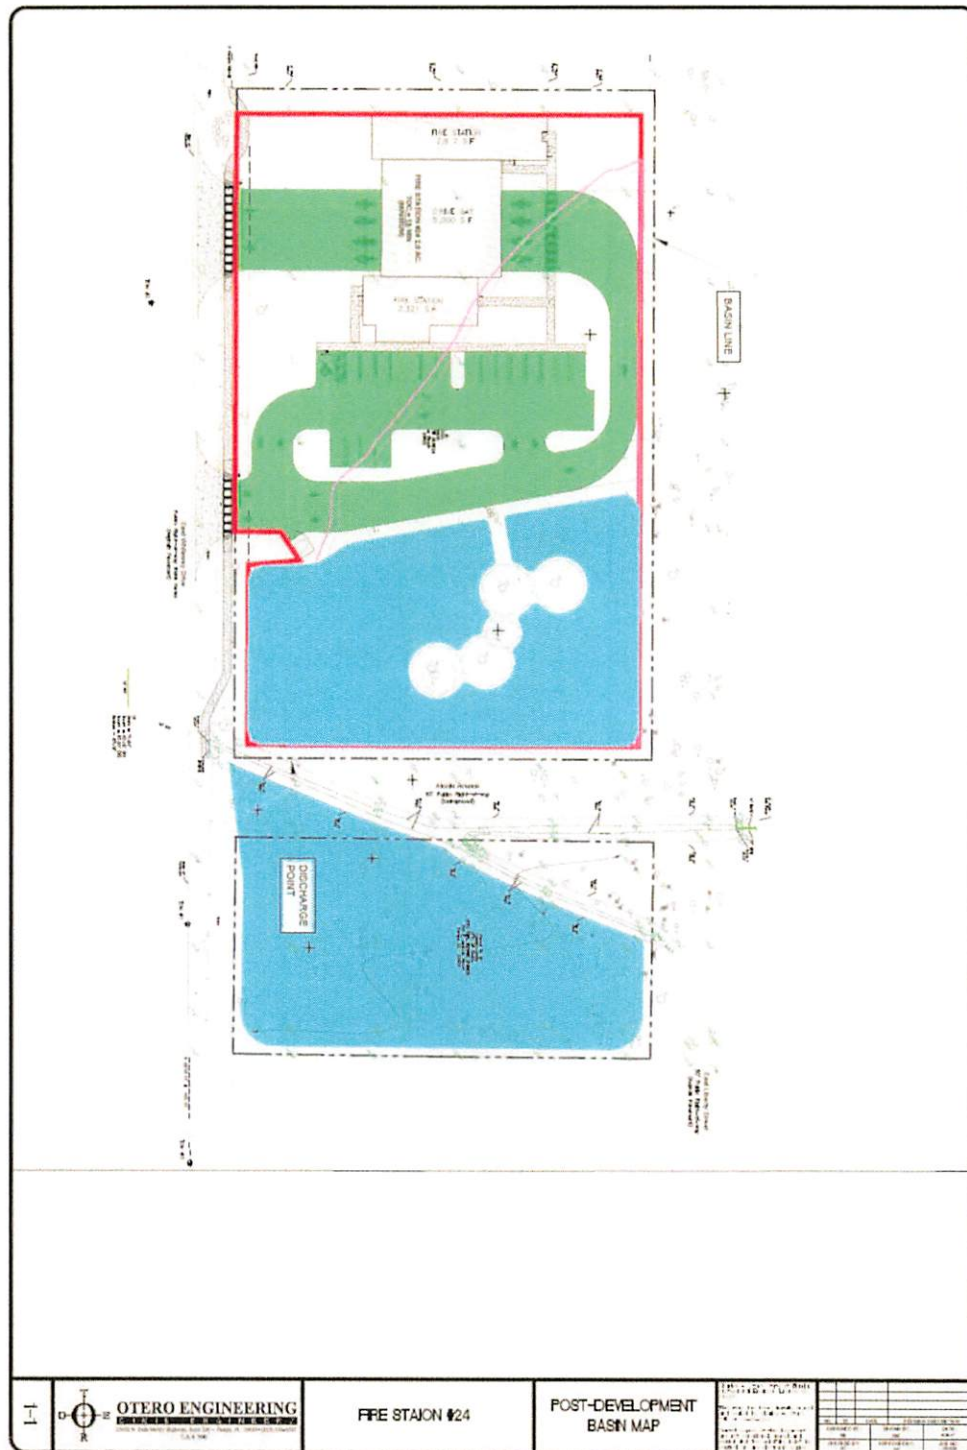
EXHIBIT B | PRELIMINARY SITE LAYOUT OF NEW FIRE STATION NO. 24 AND CAMPUS
